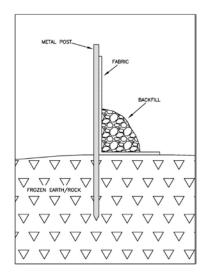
Properly Constructed Silt Fence for Frozen Earth or Rock
